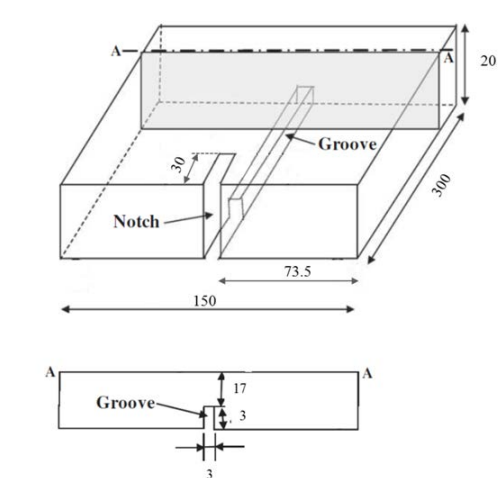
Detail of the asphalt double torsion test specimen (dimensions in mm).
